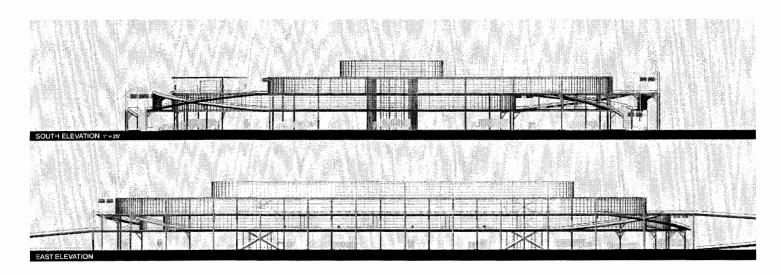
Elevations of Travel Plaza, by student, Adam Stillman.
